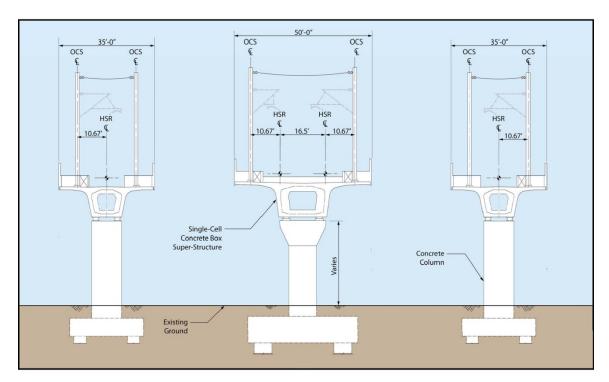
Typical High-Speed Rail Four-Track Elevated Cross Sections
